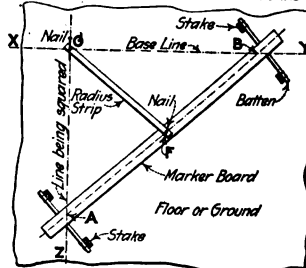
METHOD OF USING RADIUS BOARD FOR LAYING OUT
